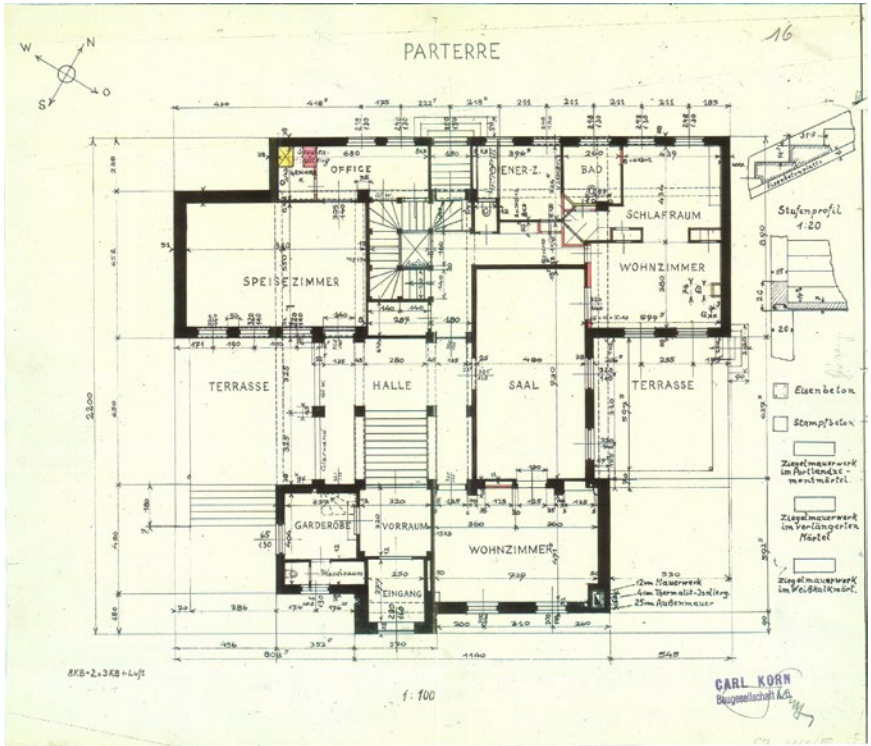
GROUND FLOOR PLAN OF THE WITTGENSTEIN HOUSE.
